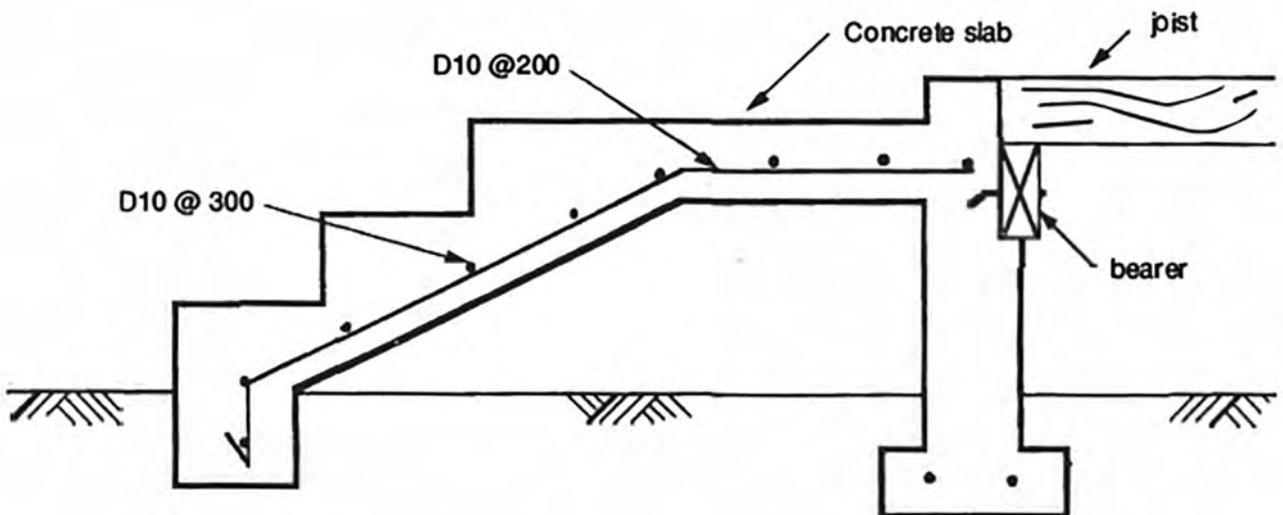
DETAIL OF CONCRETE STEPS
